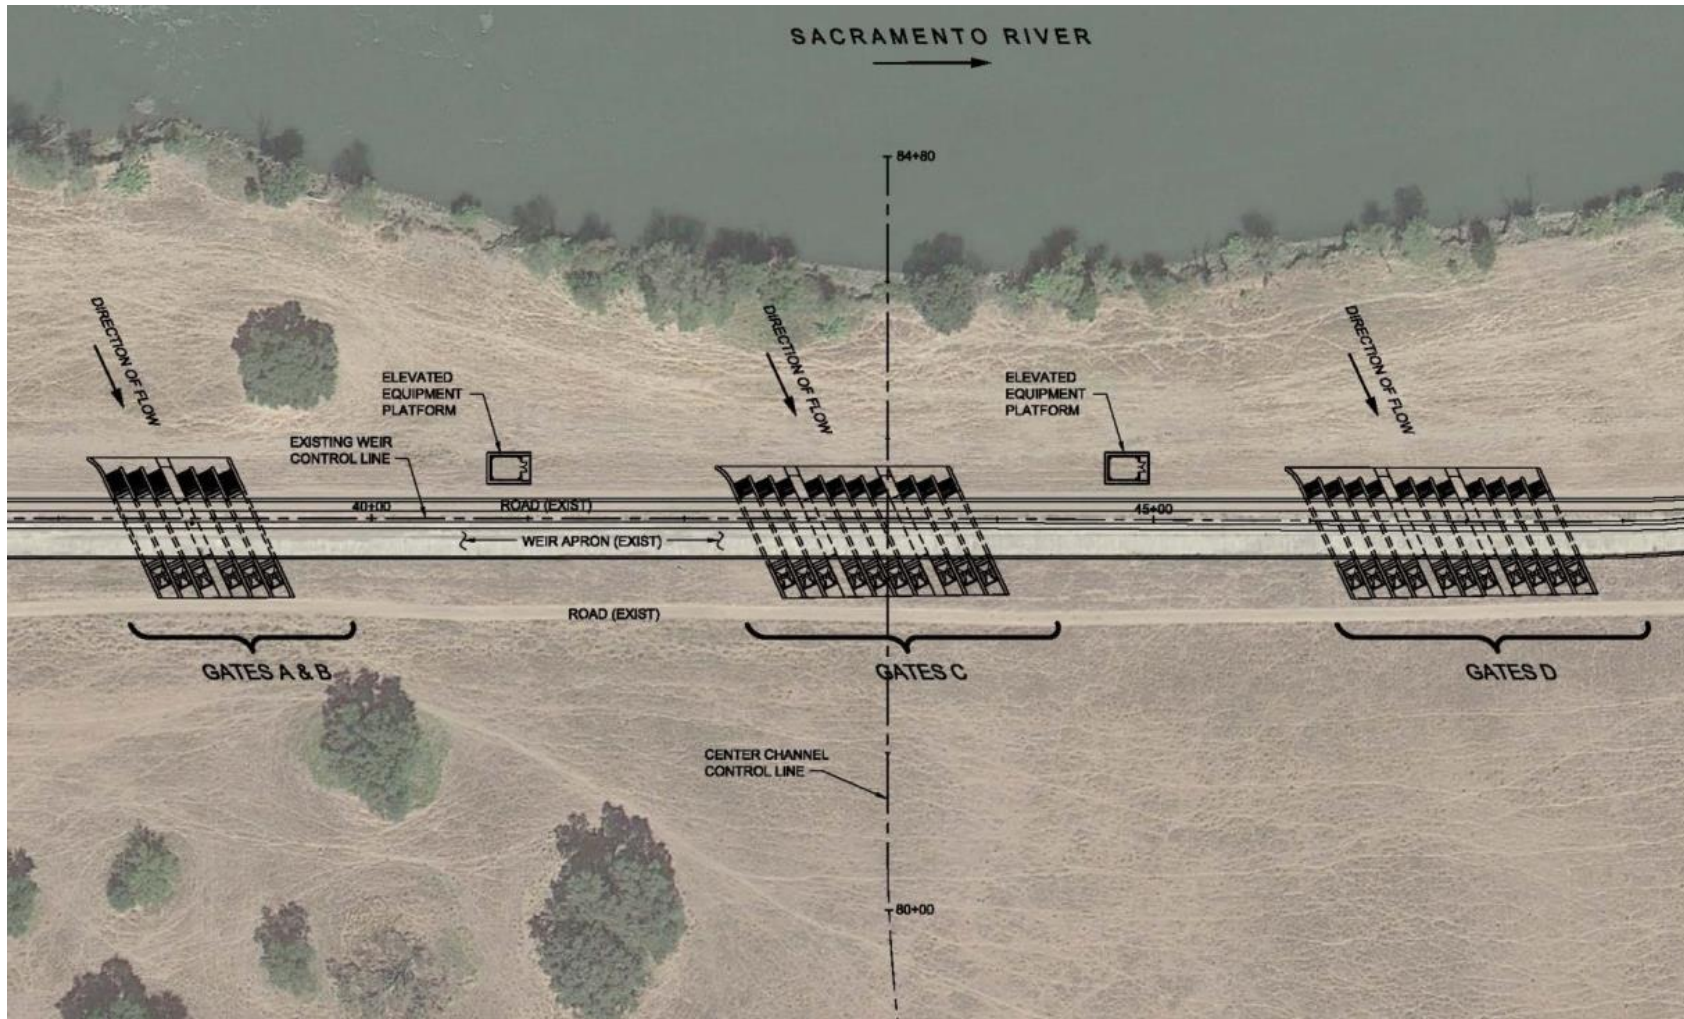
Alternative 5 Headworks (view from top looking down)
